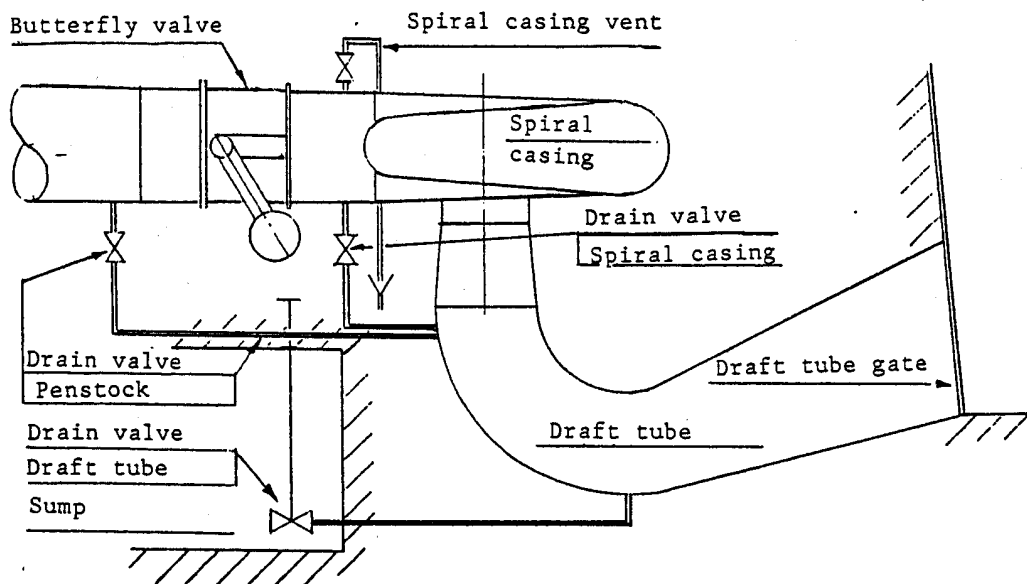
Schematic drawing of a Francis turbine complete with inlet valve and draft tube
